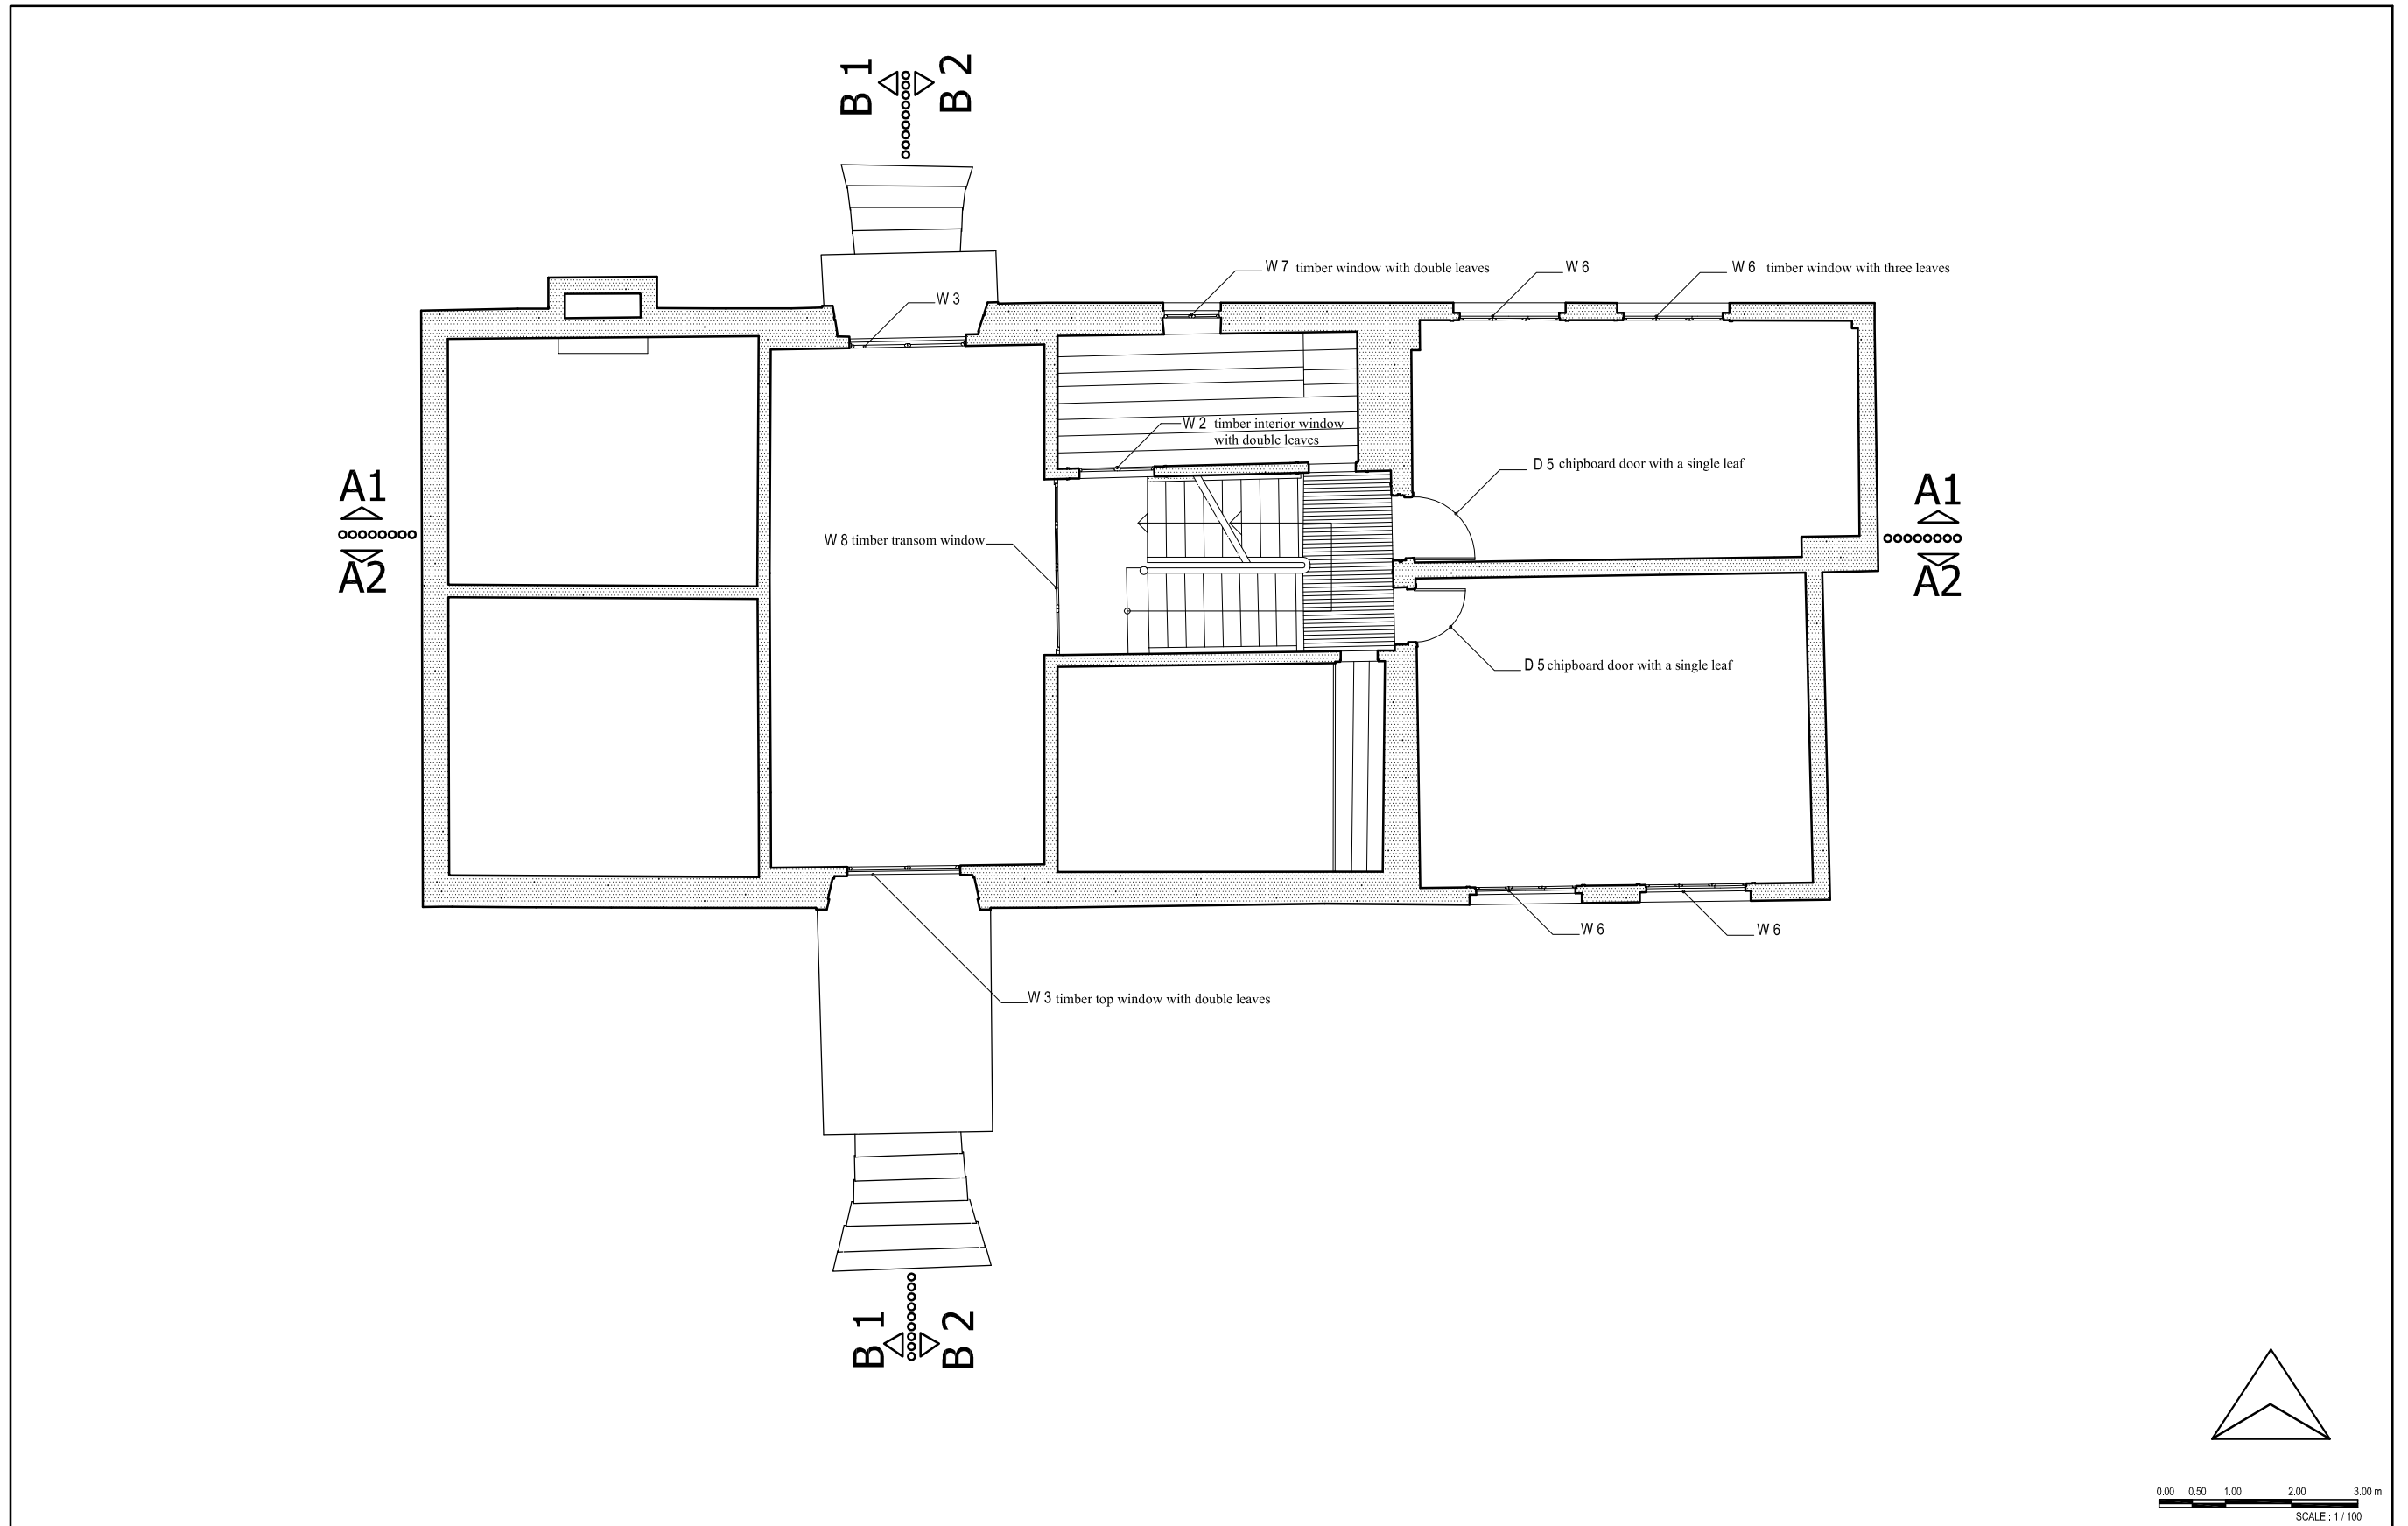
Analysis of Architectural Elements - Mezzanine Floor Plan
